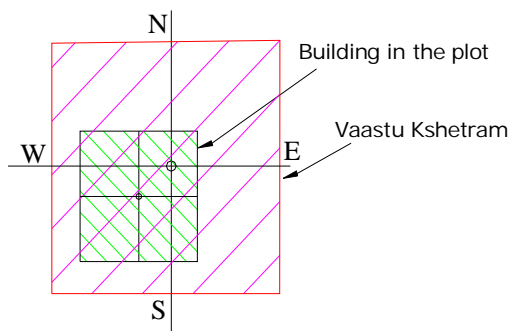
The Building is placed on the SW (Nirrti) segment of the plot. (Building can face either North or East)
